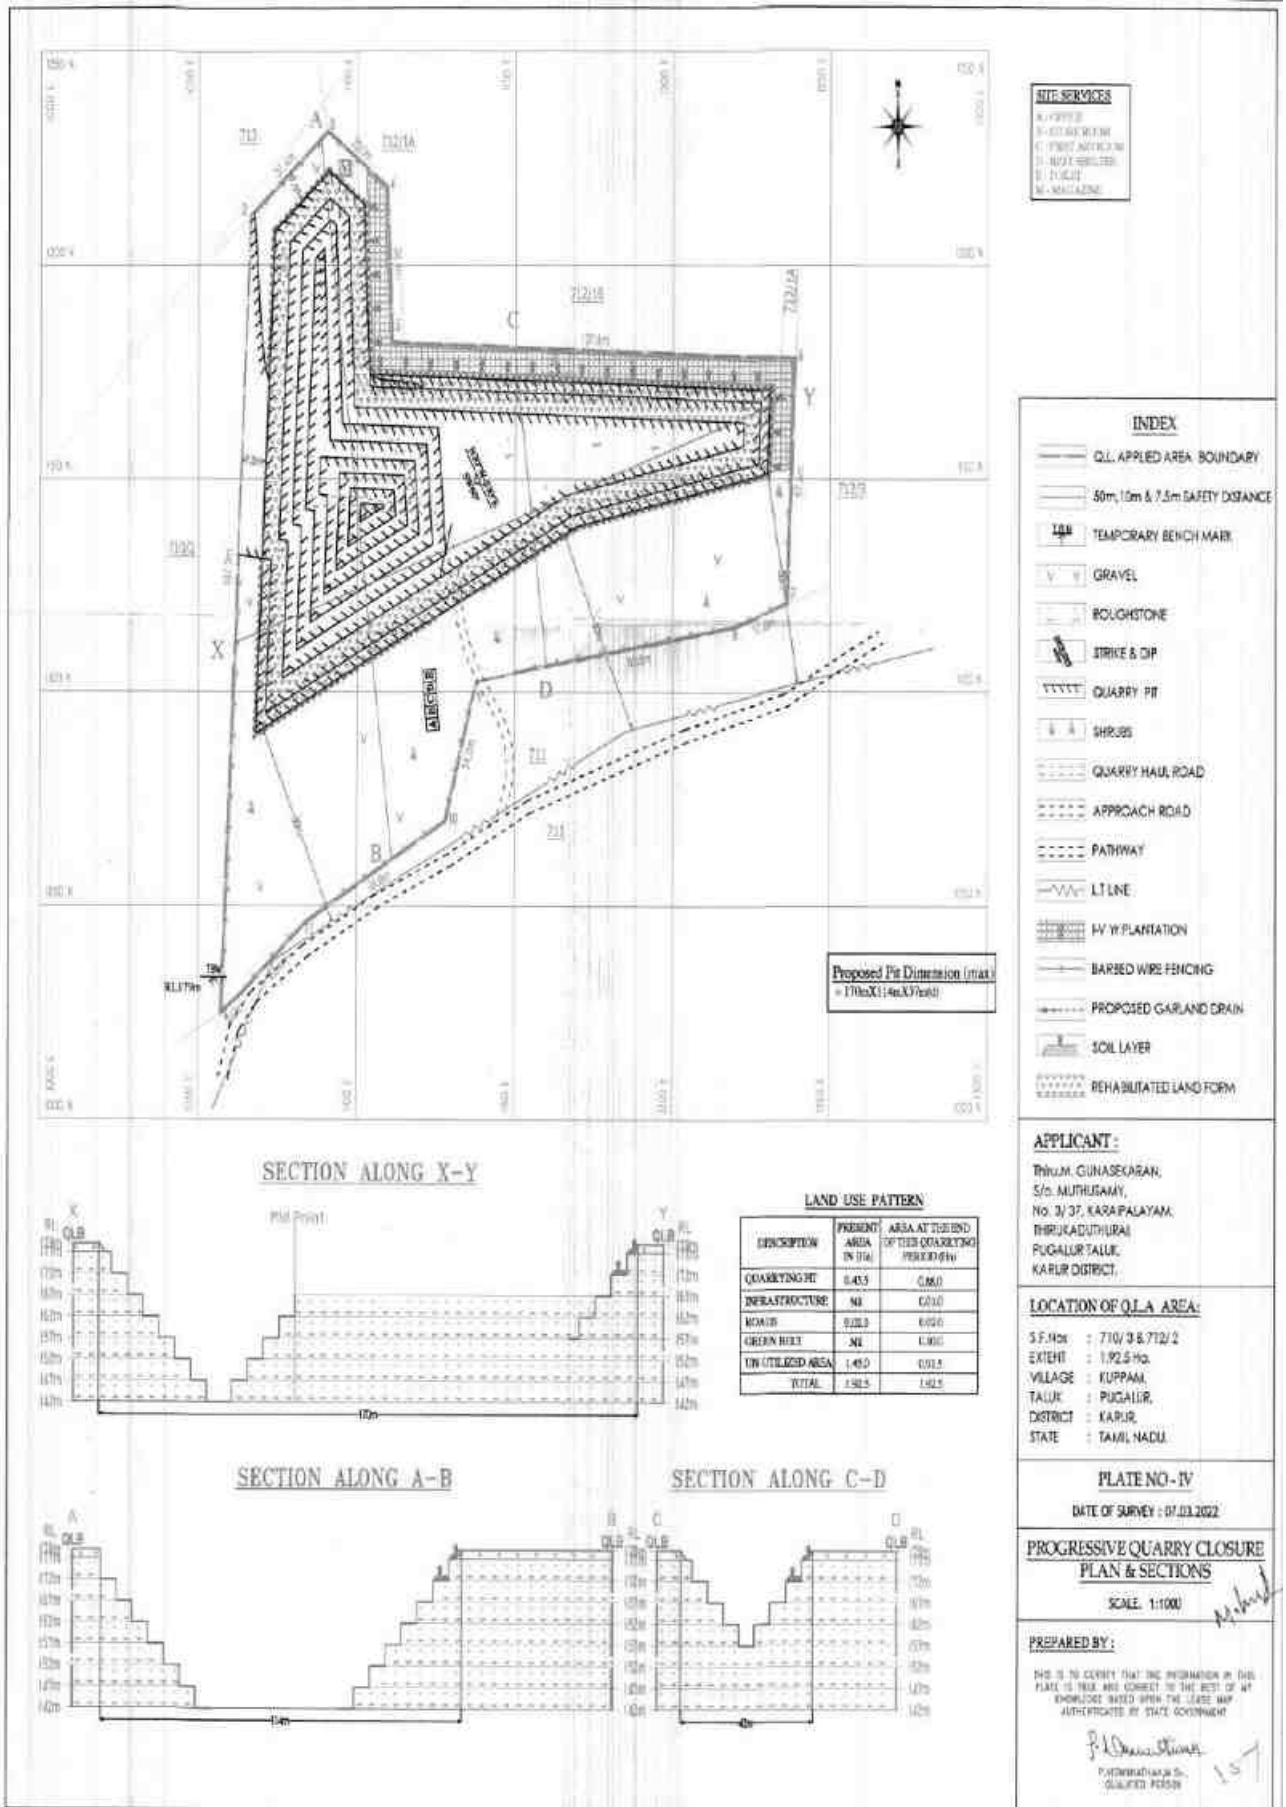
CLOSURE PLAN AND SECTIONS
